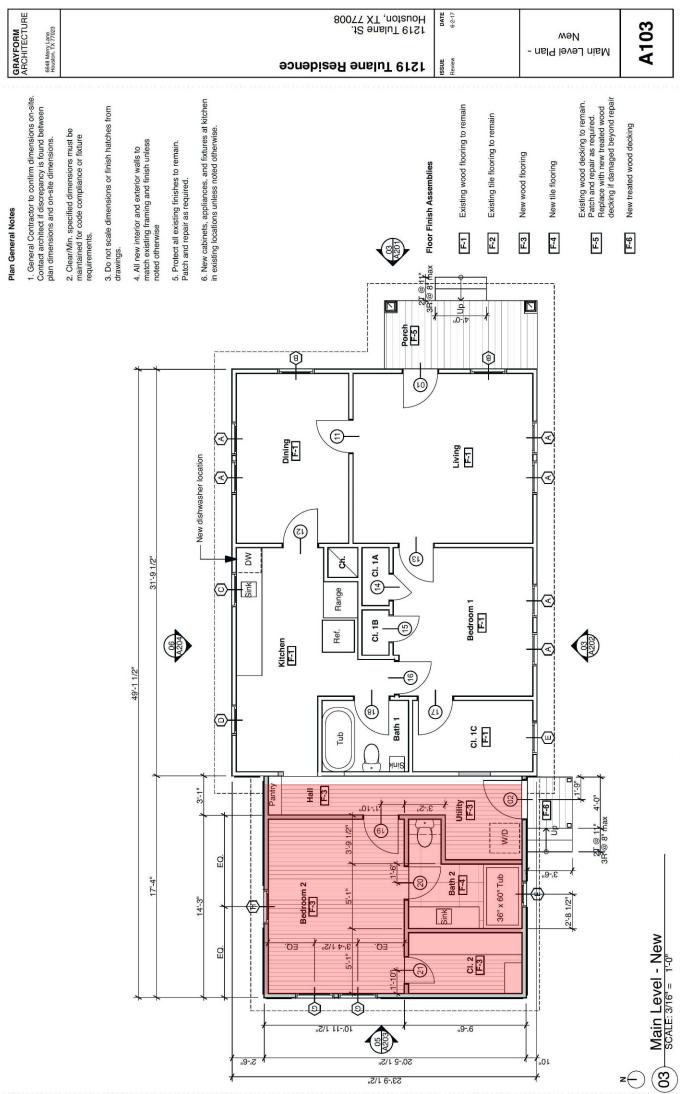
Current Floor Plan 1219 Tulane. The addition is shaded red.
